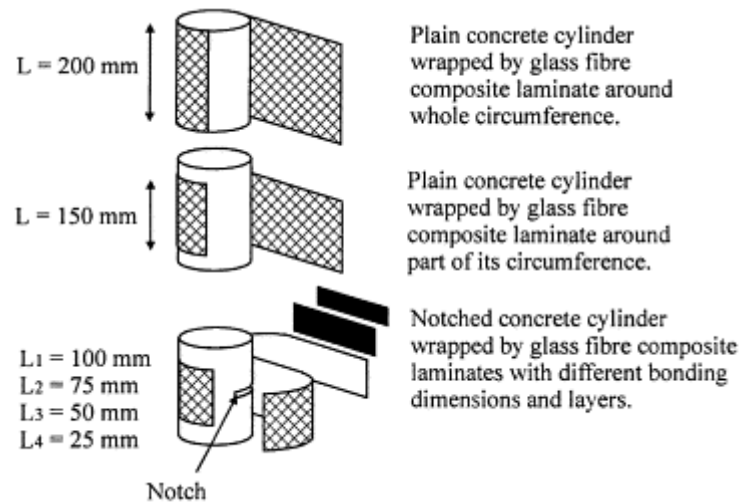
Schematic diagrams of the plain and notched concrete cylinders wrapped by glass–fibre composite (ref.3).
